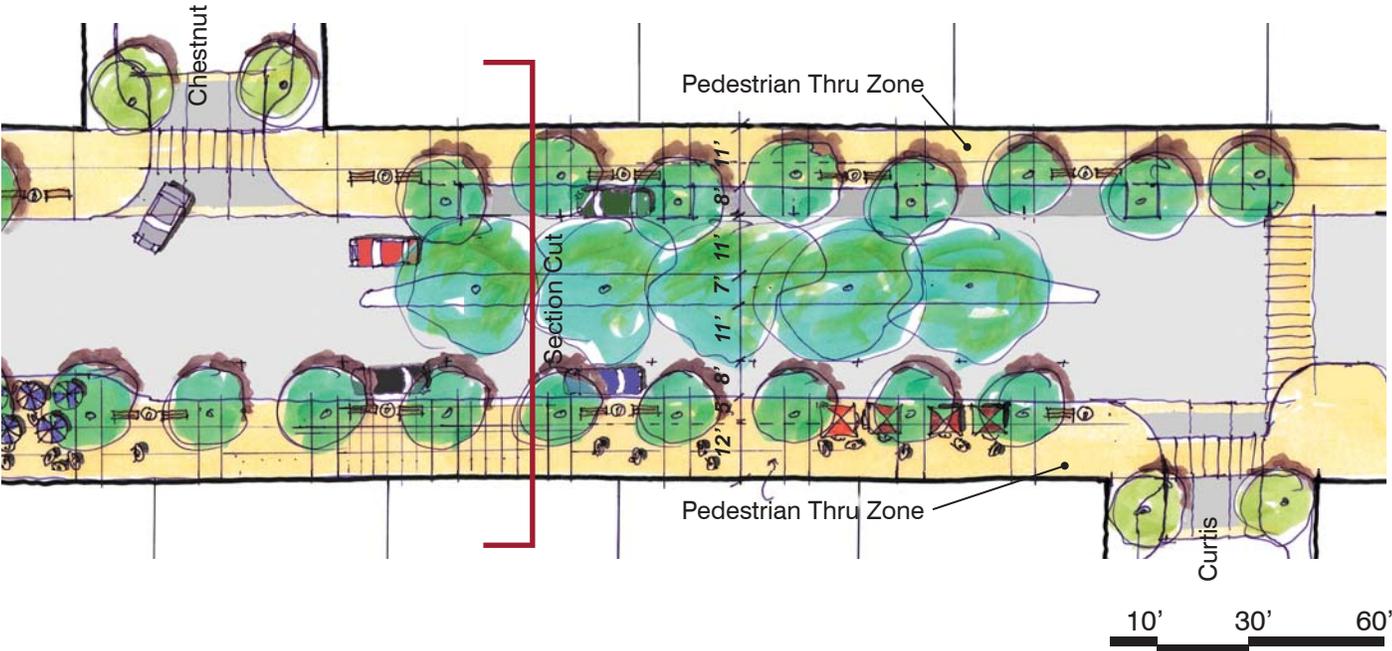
Plan of Santa Cruz Avenue with major streetscape improvements. This plan does not feature the Central Plaza described in the next section.
